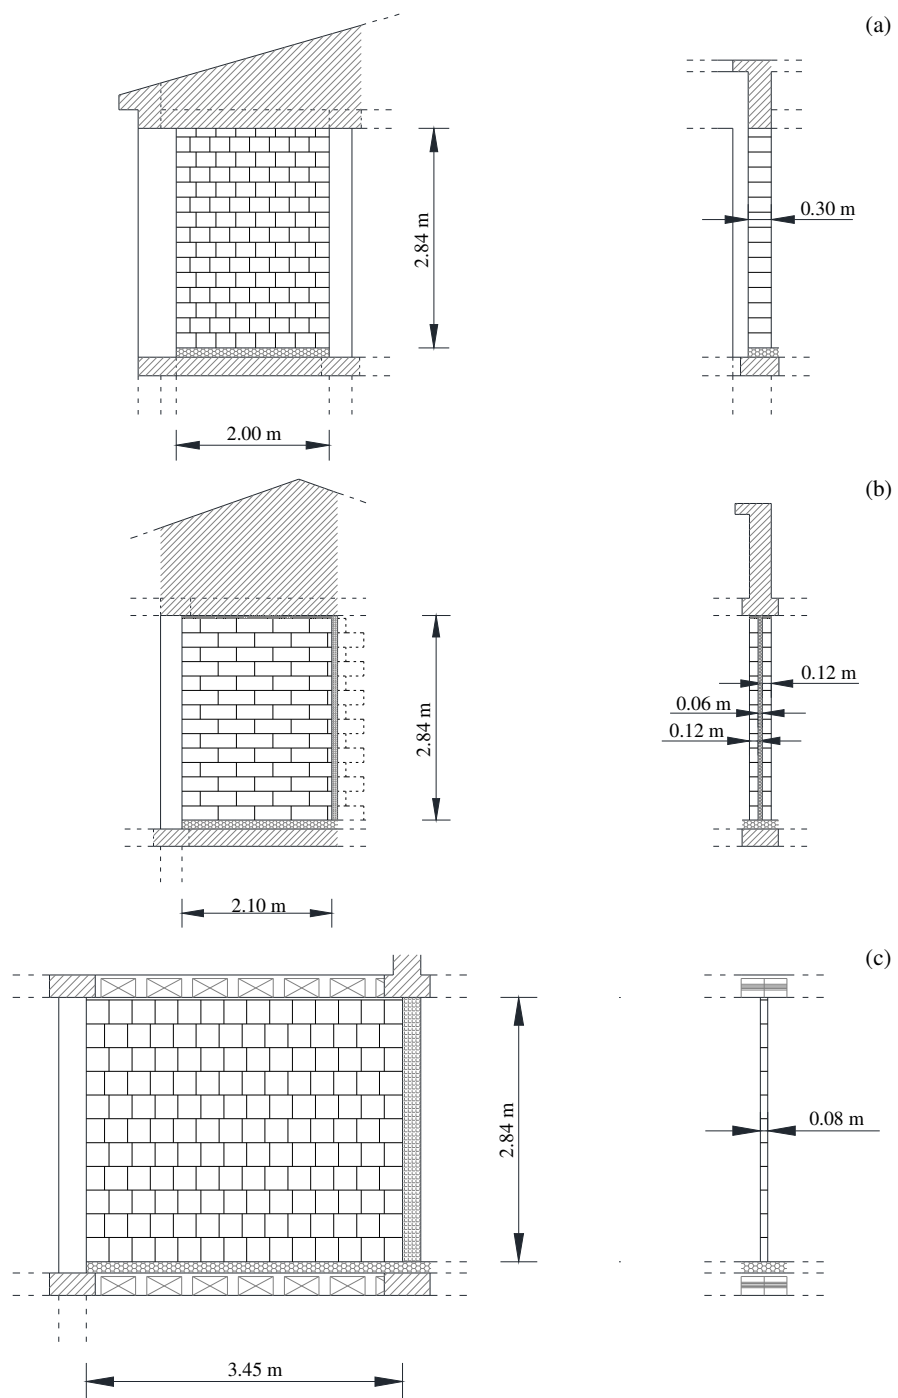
Geometry of the tested infill walls: (a) wall W1-A, (b) wall W2-A, (c) wall W3-A.
